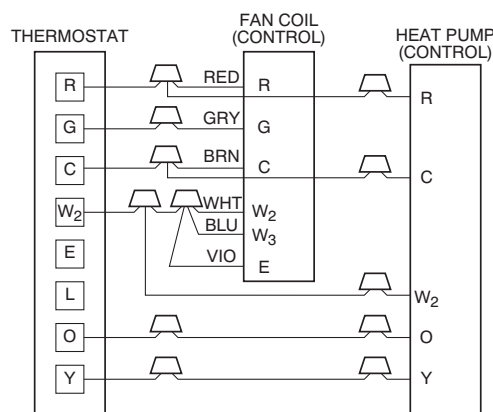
Wiring Layout – Heat Pump Unit (Cooling and 2-Stage Heat with No Outdoor Thermostat)
